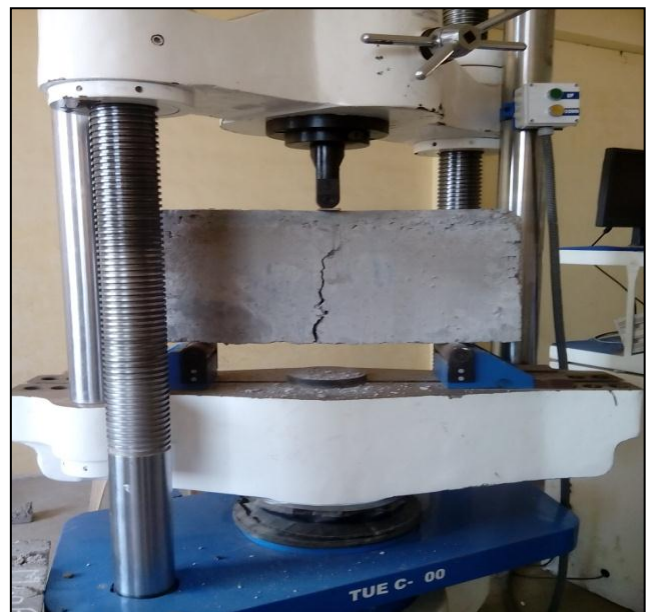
Test Setup of CTM with Fixed Roller Base for Shear
